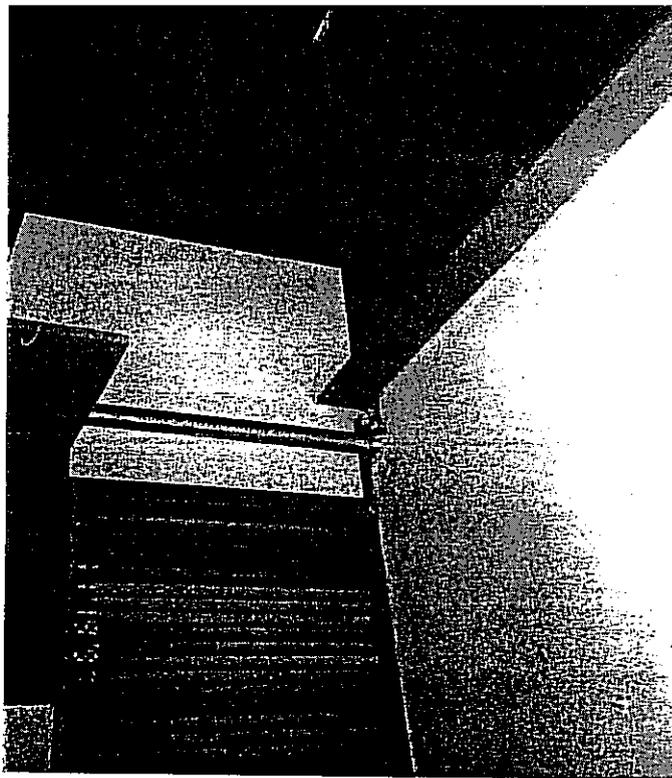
Typical connection of floor beams to column top. Notice the connection is not designed as a moment resistant connection. The steel deck floor is tack welded to the floor joist.
